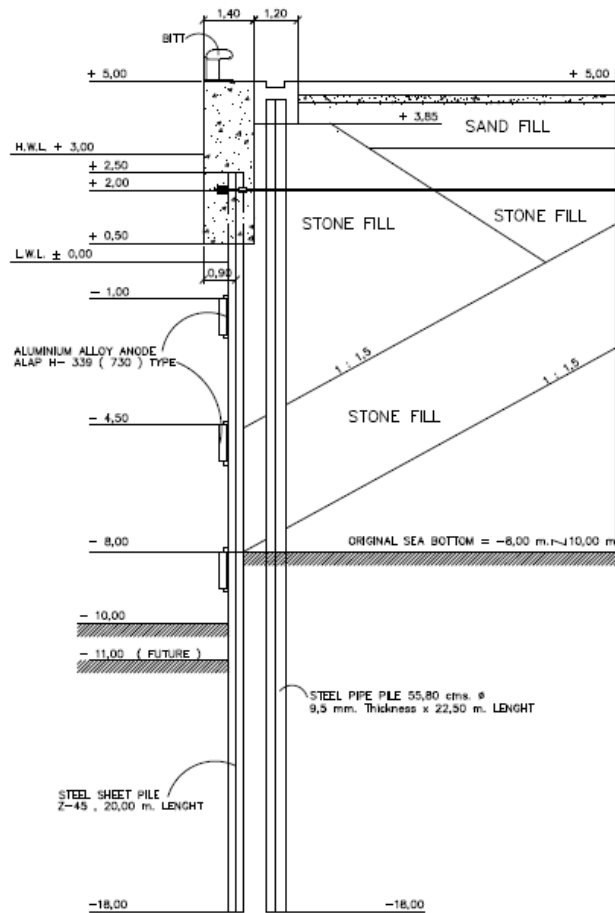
Cross section trough sheet pile wall at Berth N.1.
